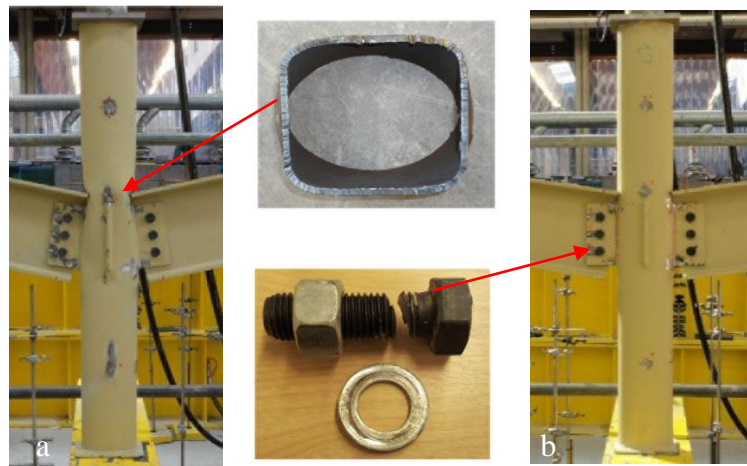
Typical failure modes: (a) hollow connection (Joint-A); (b) concrete-filled connection (Joint-AC)
